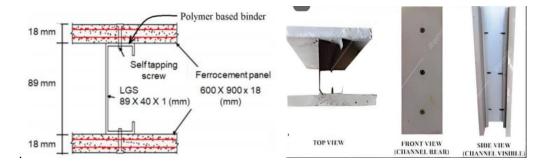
(a) – Section of Ferrocement-LGS panel sandwich wall unit
